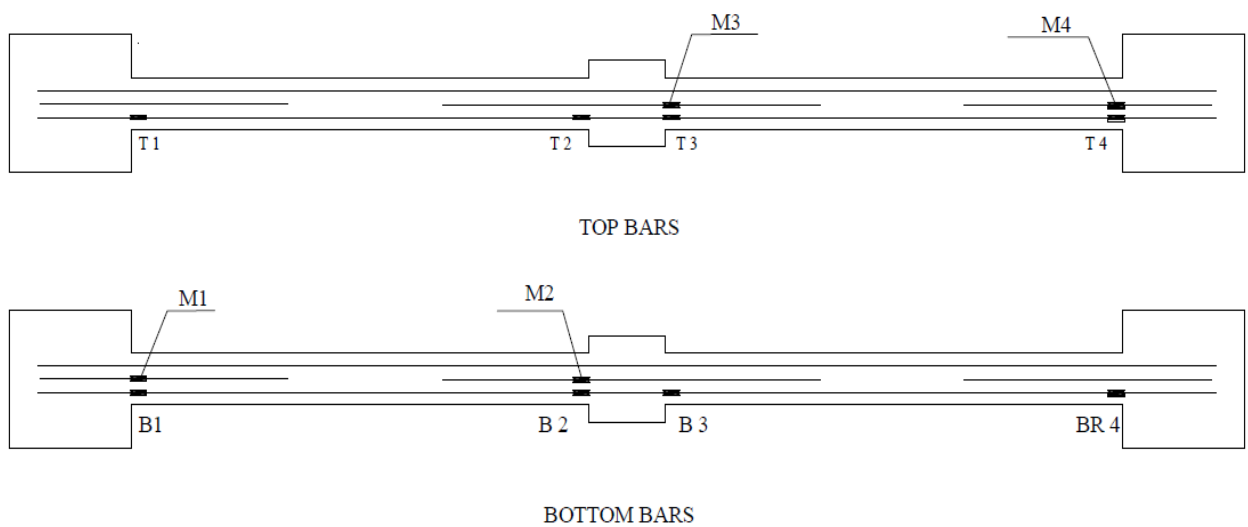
Strain Gauge Layout for Specimen SS-7
